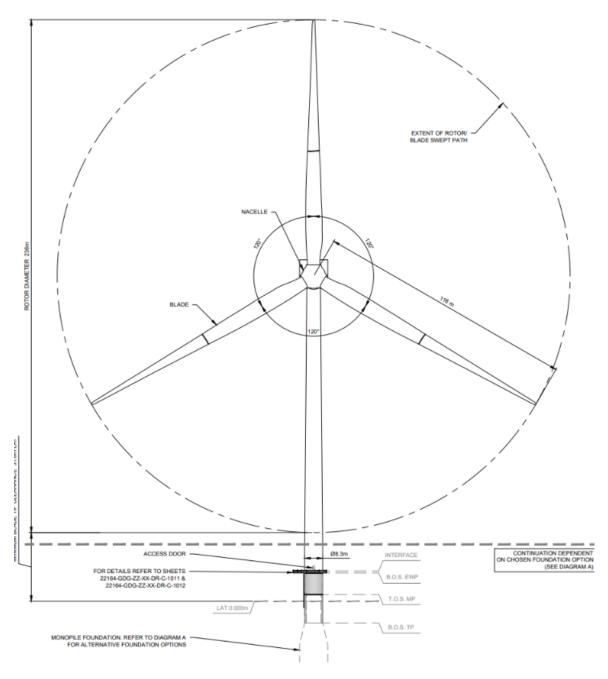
WTG Option A Wind Turbine Generator (236 m Minimum Rotor Diameter) (Refer to drawing 22164-GDG-ZZ-XX-DR-C-1000)
